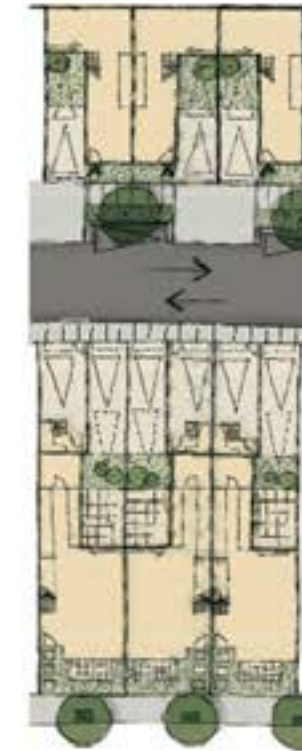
Indicative Townhouse Plan (Source: HASSELL, 2008)
